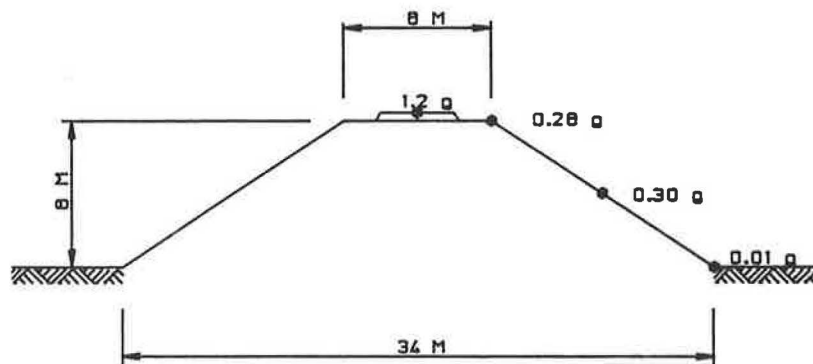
Vertical accelerations at the surface of an instrumented SNCF railroad embankment.
